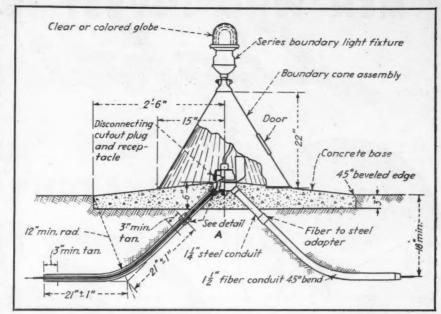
Underground connections to airport tip-over boundary light units. Details show method of providing mechanical protection to cables entering the cut-out receptacle.
